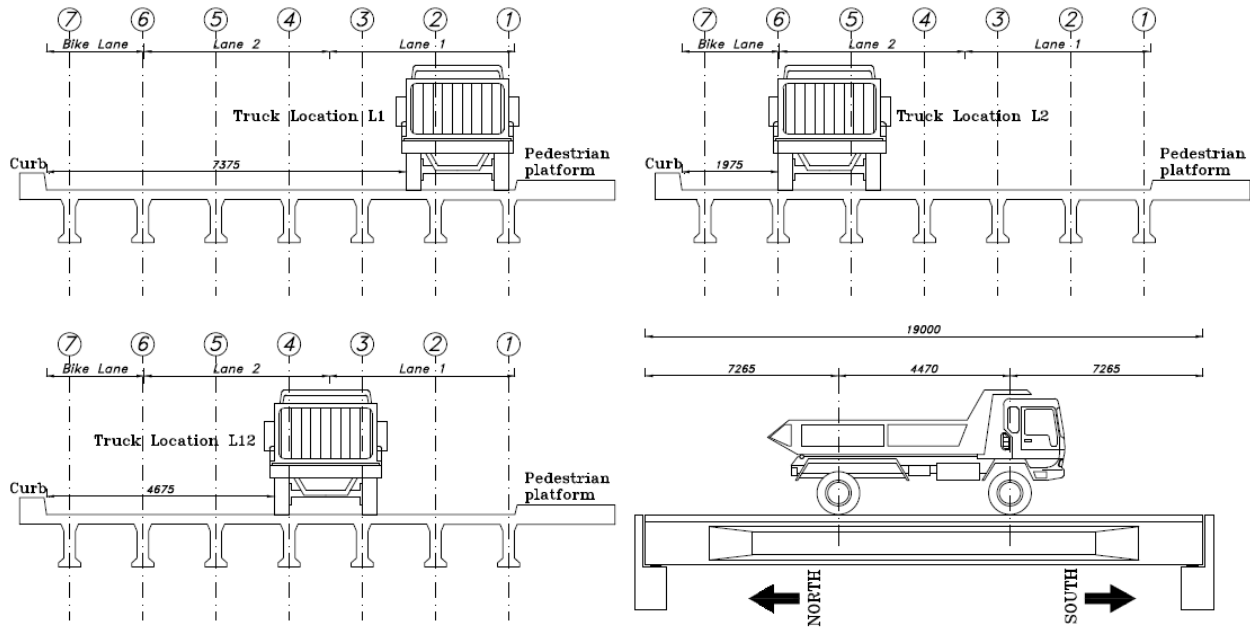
Static loading plan. Dimensions in mm [1 mm = 0.0394 in]
